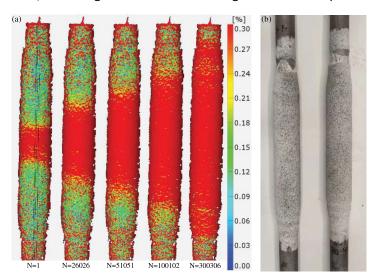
Failure modes of specimens (a) debonding crack propagation under cyclic loading; (b) steel tubes pulled out after static load
